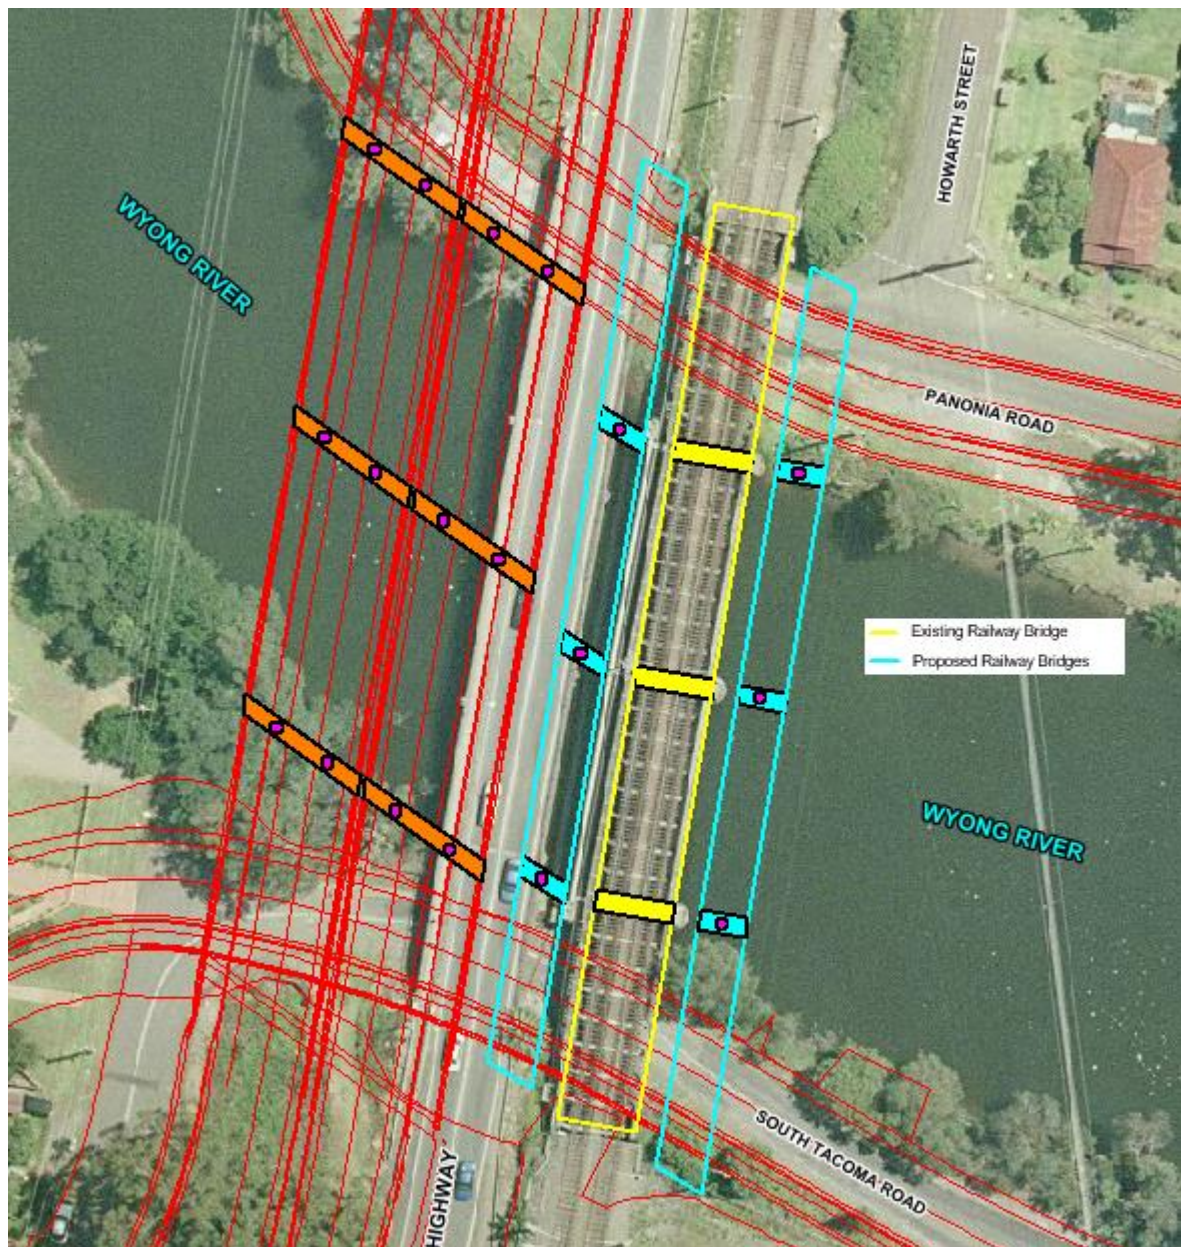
Assumed Arrangement of Future Railway Duplication at Wyong River
